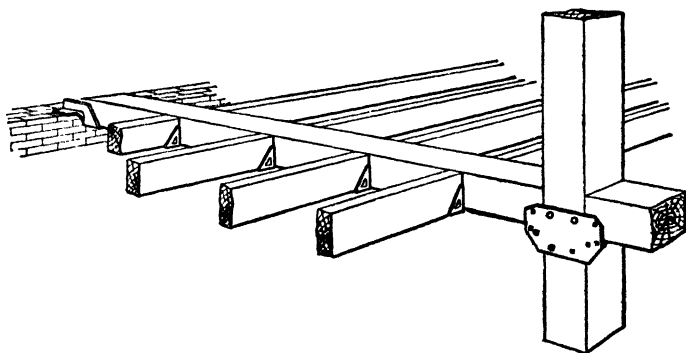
Floor-framing with Duplex Hangers and Post-caps
